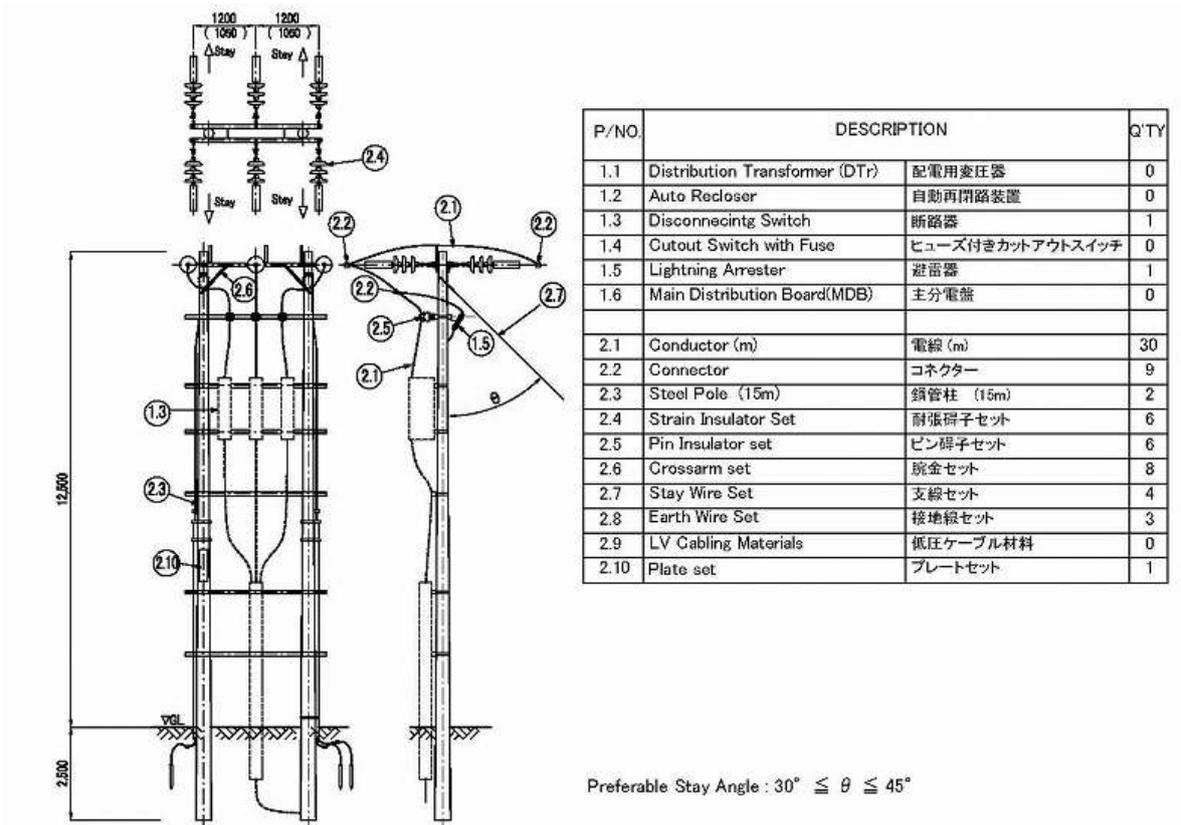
34.5/11.5 kV Disconnecting Switch Pole (Vertical Section Type)
